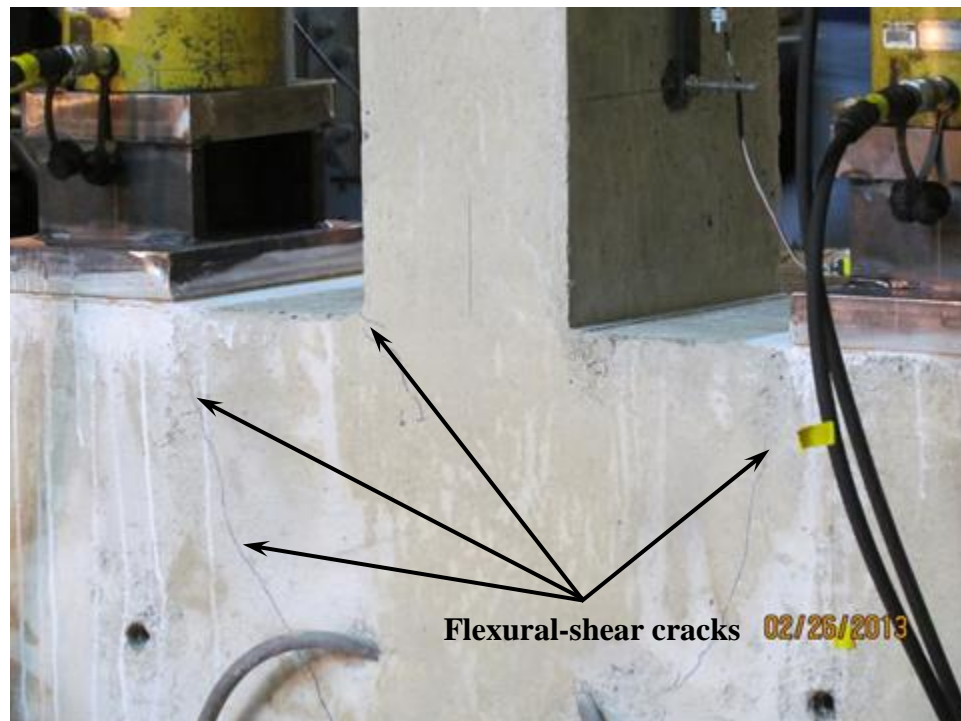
Flexural-shear cracks in bottom beam of TS02
